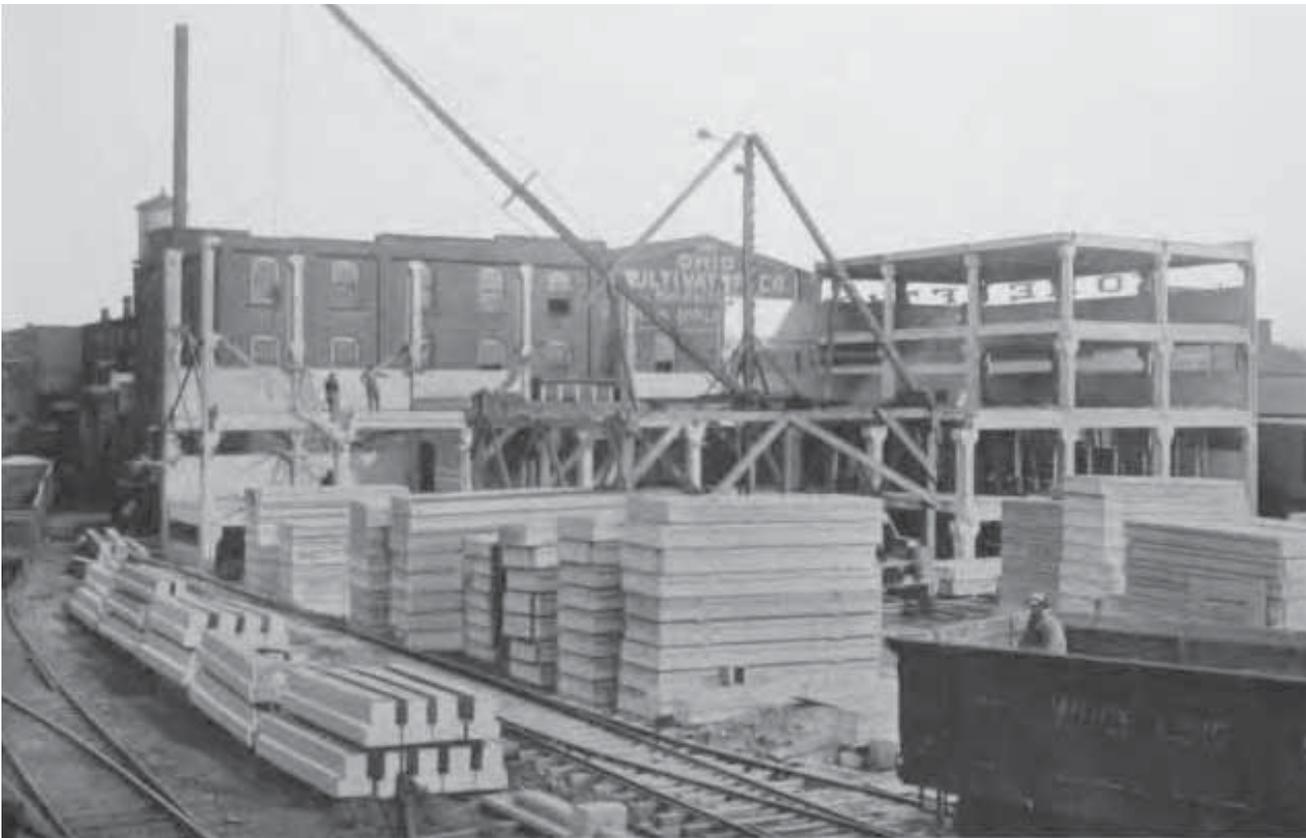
A precast concrete building within the Ohio Cultivator Co. complex in Bellevue, Ohio, during construction. The precast concrete elements stacked in the foreground were delivered to the site and moved into place by a crane (Unit Construction Co. 1913:4).
